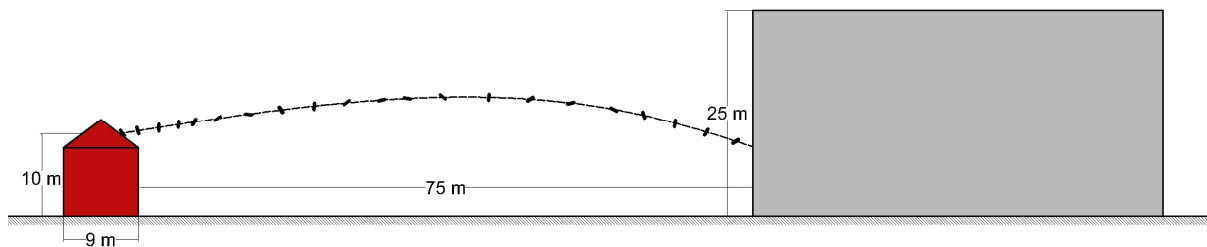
Elevation of the “source building” (red), and “target façade” (grey) that is to be designed. Mean roof height is 10 m and one roof tile trajectory is reported with the dashed line.
